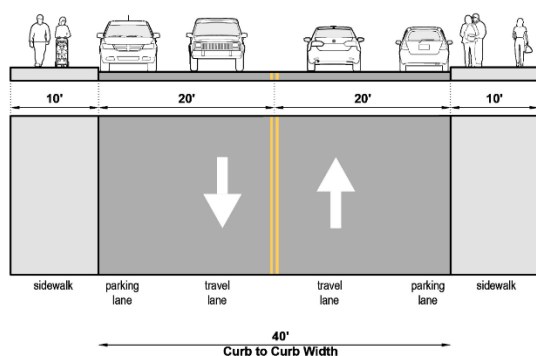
Existing conditions on 10th Street between Cedar Street and Jackson Street.
